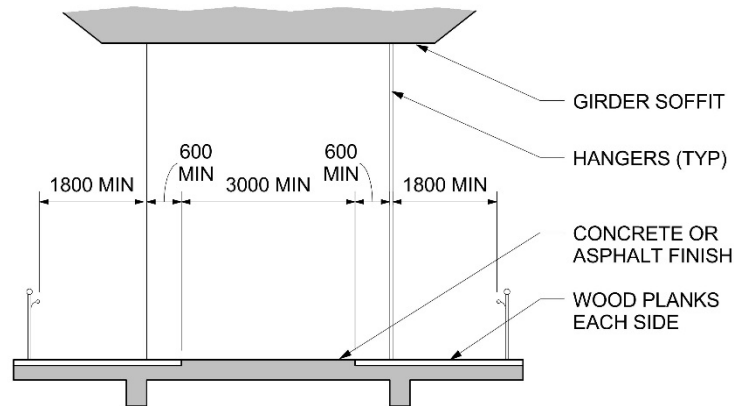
A: Tawatinâ Bridge SUP (dimensions in mm)
